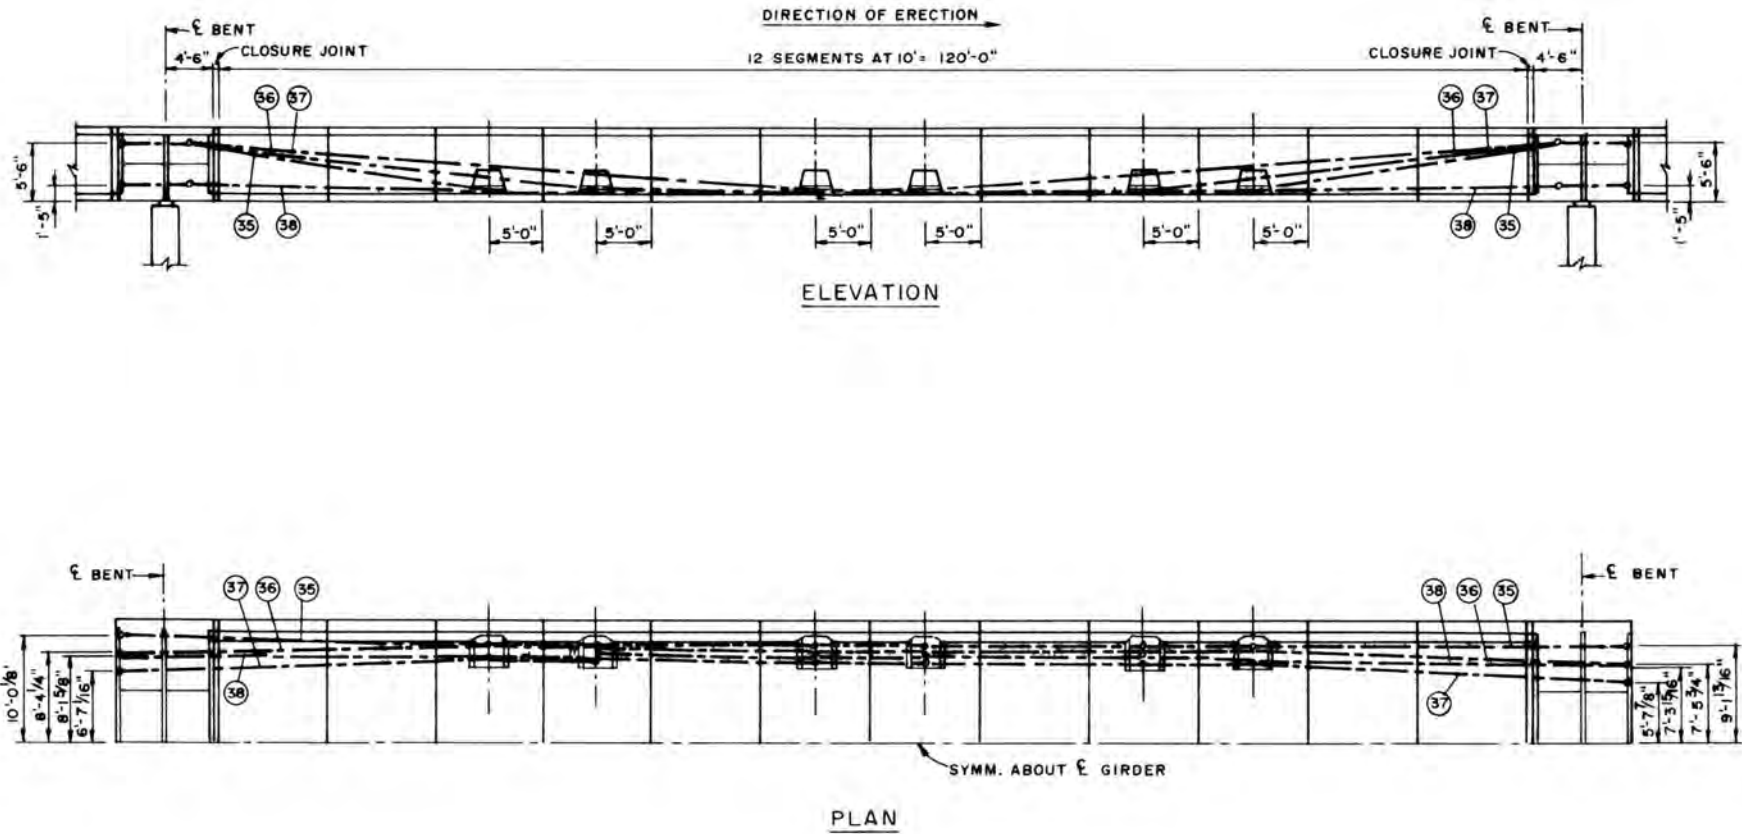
Plan and elevation of typical span-by-span post-tensioning layout.
